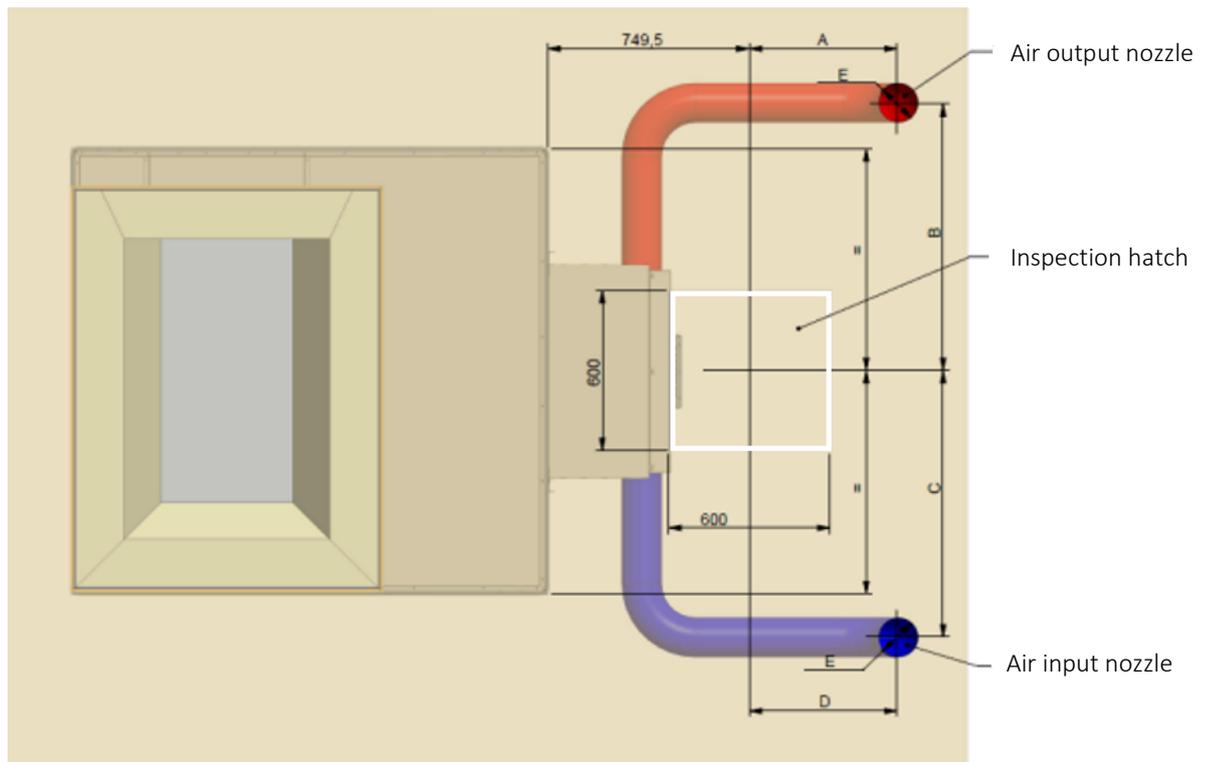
Inspection hatch and ventilation nozzle layout
